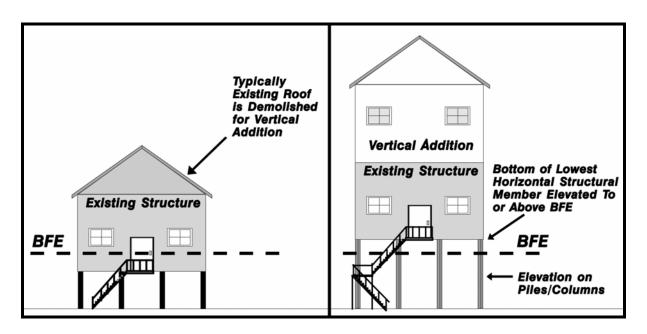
Vertical addition to a residential building in the V Zone. The new structure would benefit from post-FIRM flood insurance rates.
